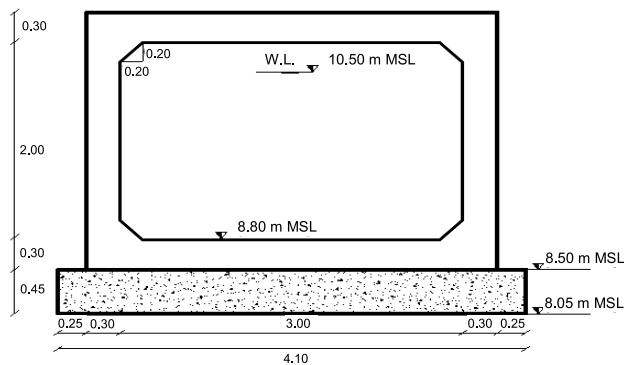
Cross section of the box culvert at km 7.000 of the Bahr Sanhoor Canal (all dimensions in metres); source: own elaboration
